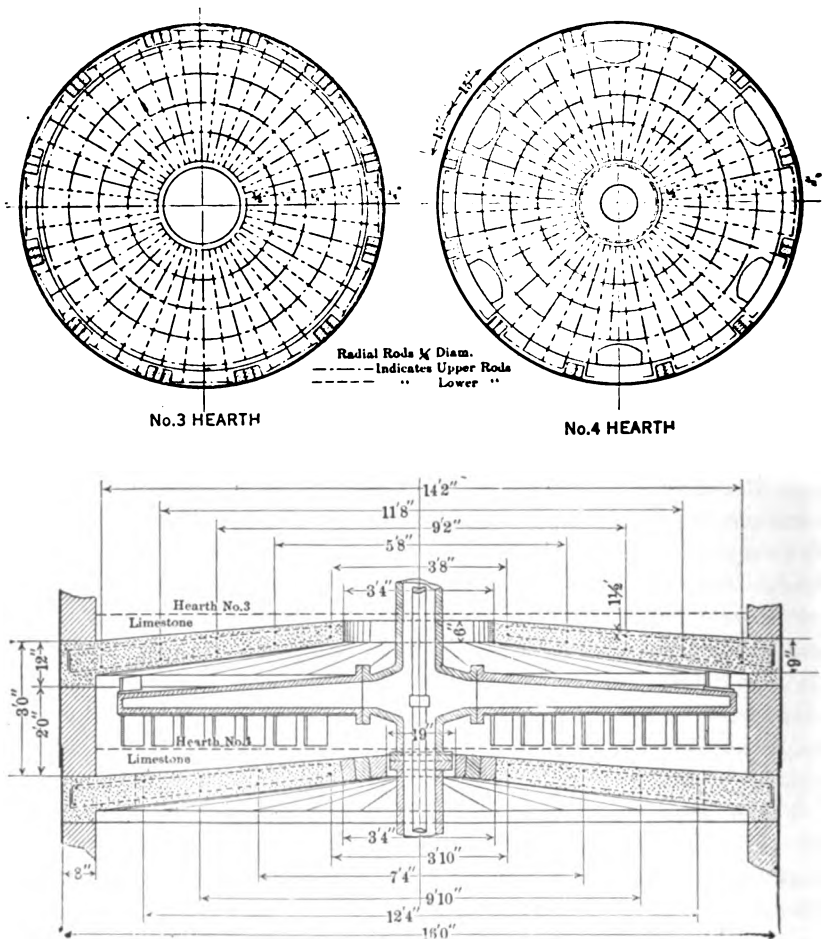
CONCRETE CONSTRUCTION OF HEARTH FOR MCDUGALL FURNACE.
